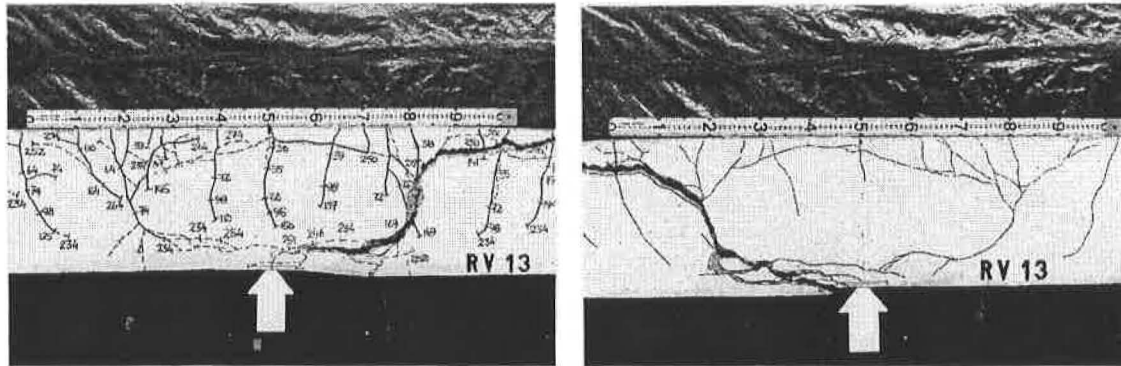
Final crack pattern of specimen RV13. Side elevation.
